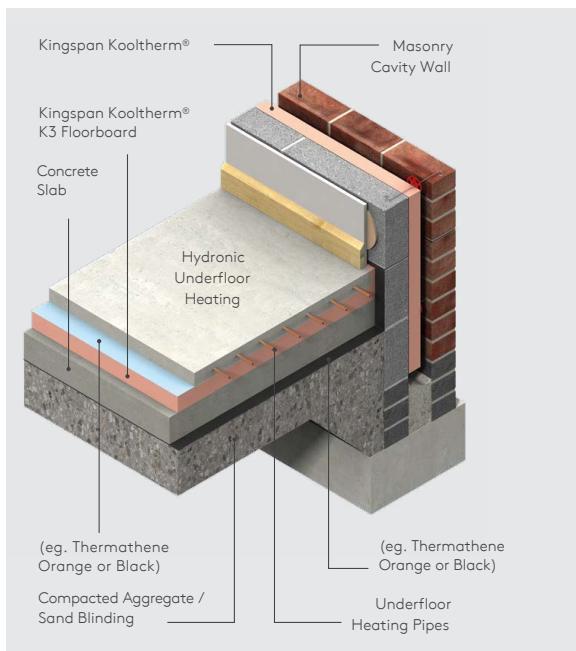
Residential concrete slab with hydronic underfloor heating on ground floor with Kooltherm® K3 Floorboard over the floor slab.
